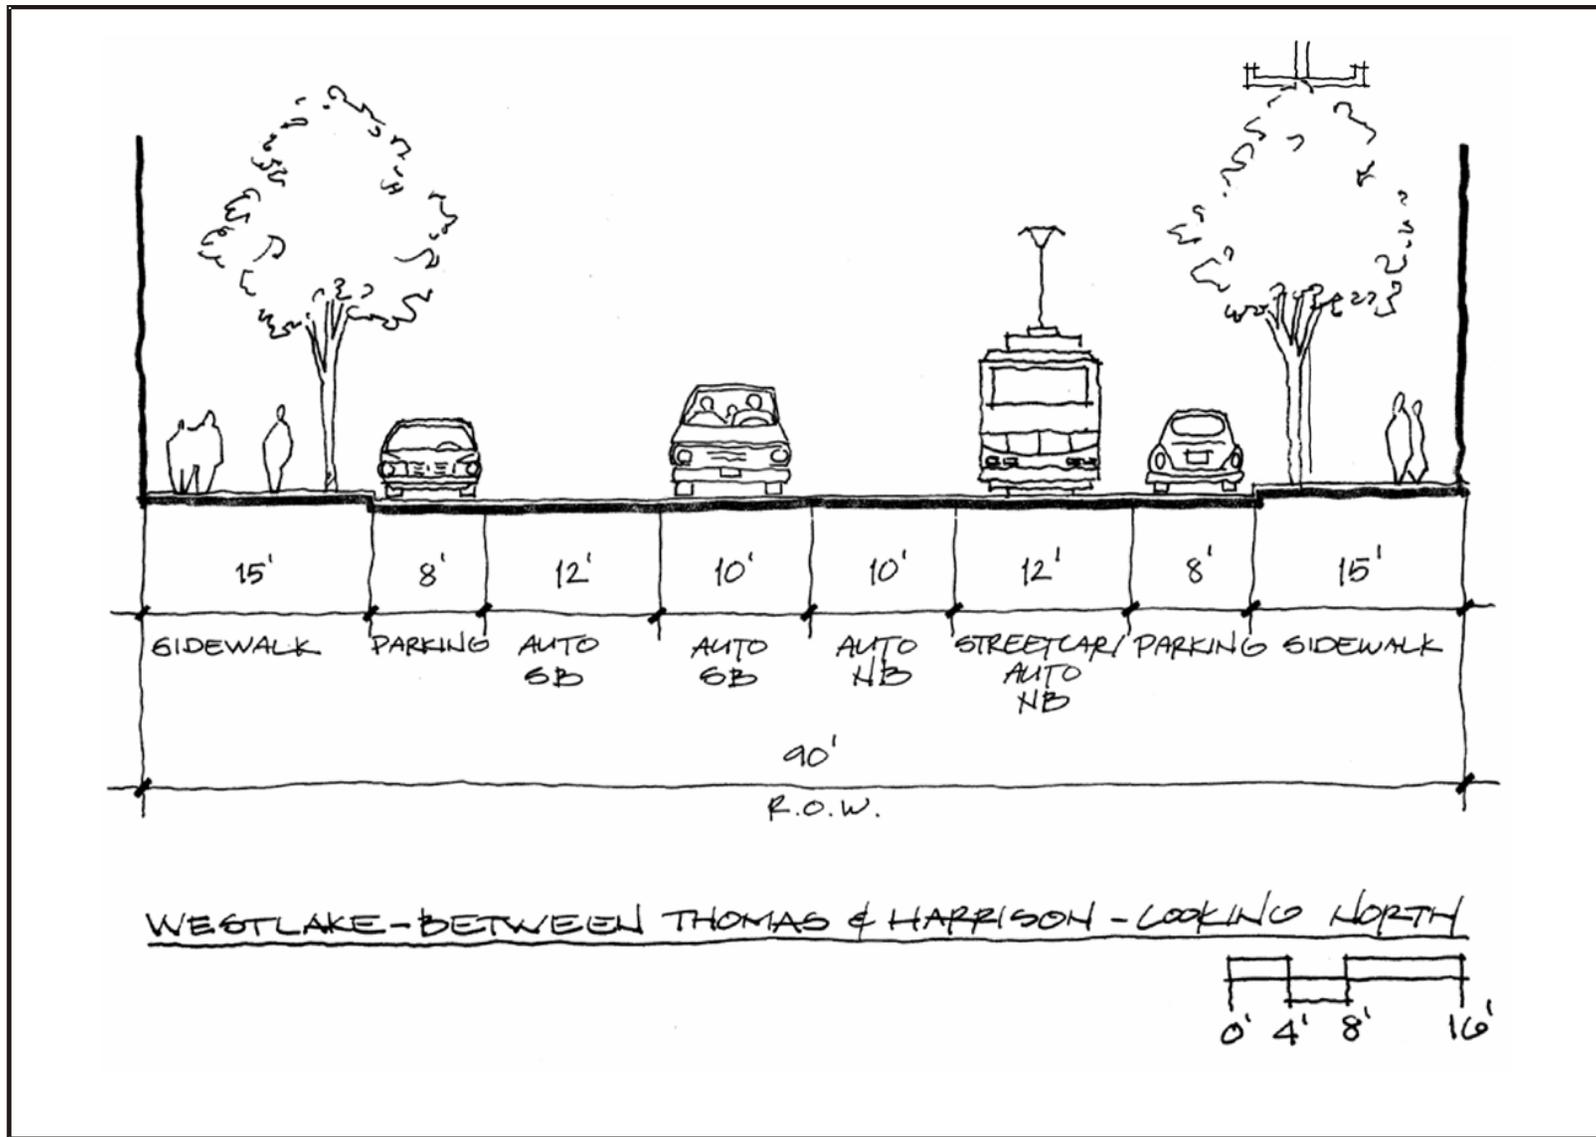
Proposed Two-Way Westlake Avenue Typical Cross-Section
